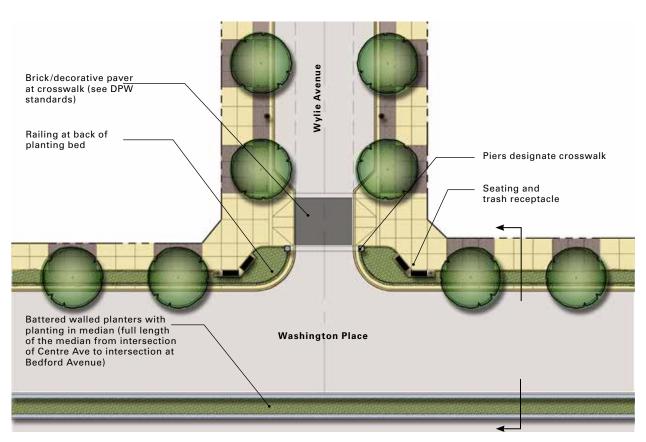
Enlarged section and plan of barrier control at intersection of Wylie Avenue and Washington Place. Battered wall planters, similar to the planters at Grant Street will be used in the median along Washington Place. At the intersection, a railing, planting bed, and street trees will help deter cross block pedestrian traffic.
